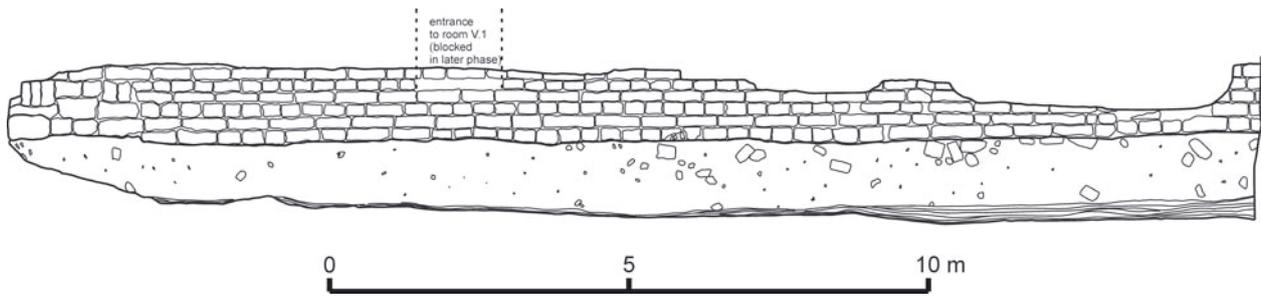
Elevation of the northern outer wall of the building [834/838]; marked entrance leading to room V.1, blocked in a later phase (Drawing P. Sójka, Ł. Jarmużek).
